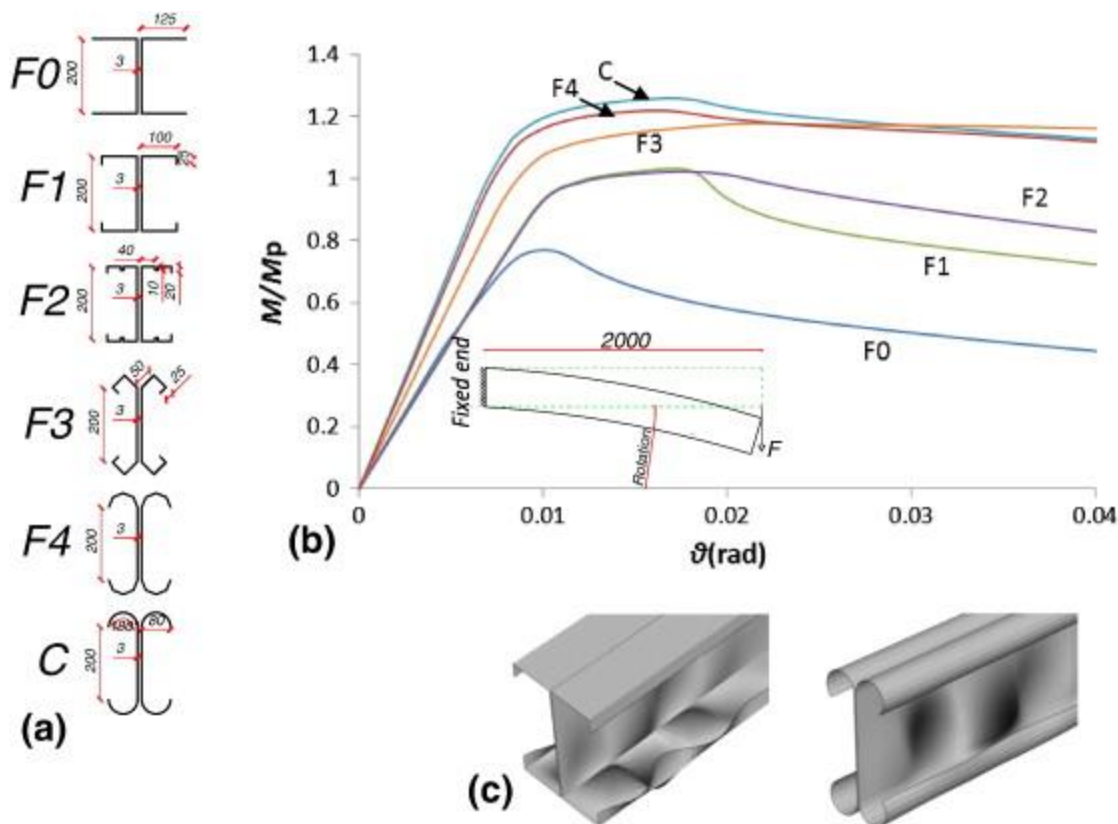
Comparison of beams with different cross sections: (a) section shapes, (b) moment–rotation diagrams for fixed end beams with cross sections F0 to F4 and C, and (c) predominant buckling modes of sections F1 and C (Bagheri Sabbagh et al., 2013)
